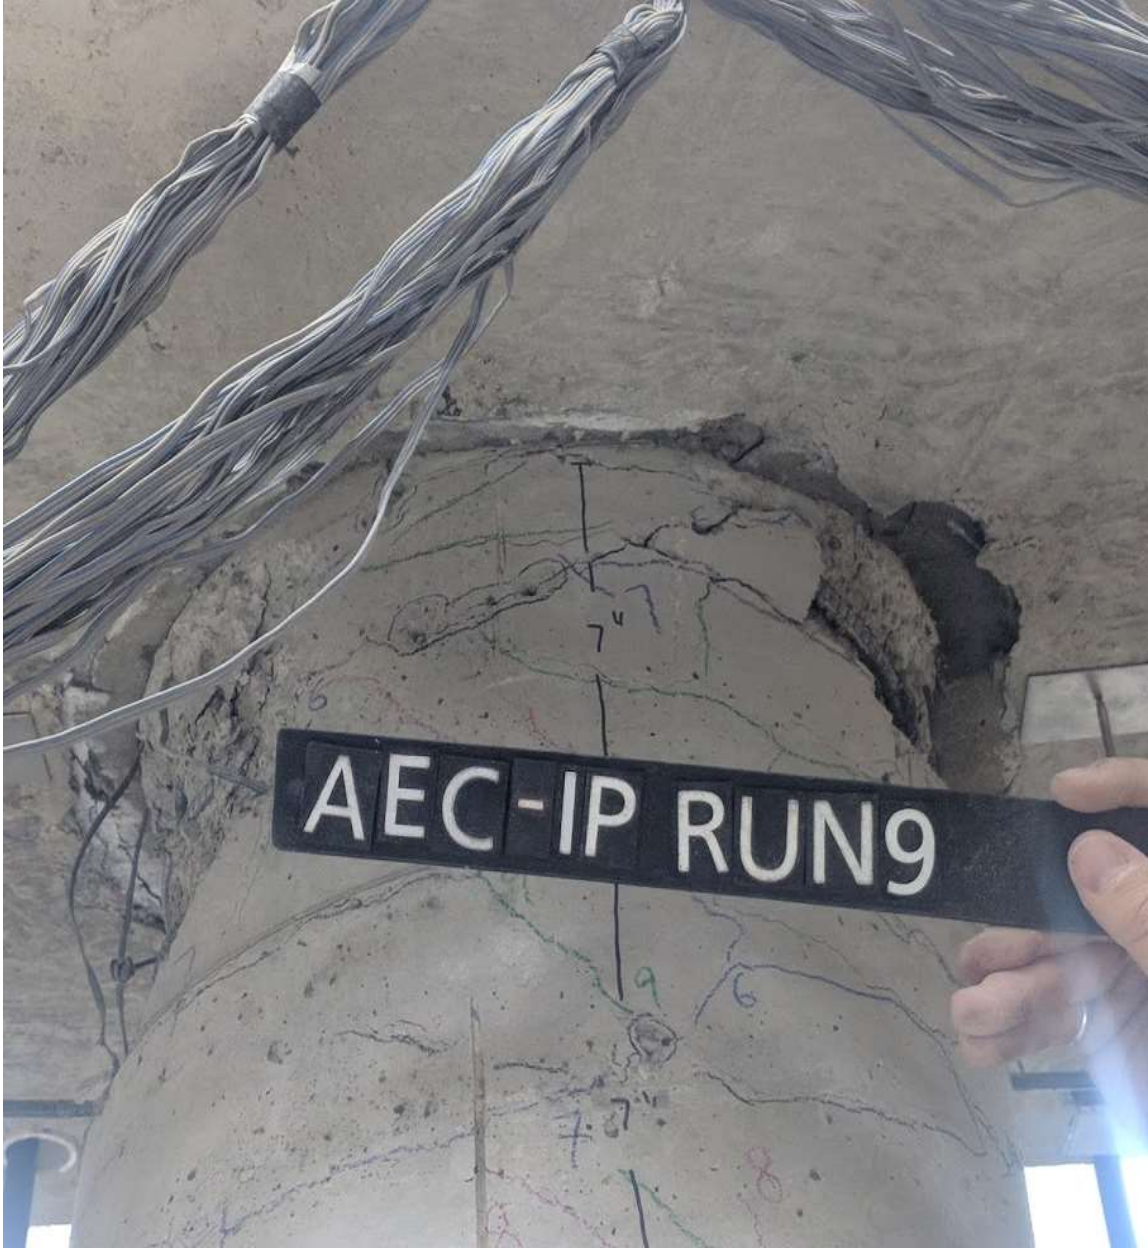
Run 9 – Final damage of west face (ABC – W face)
